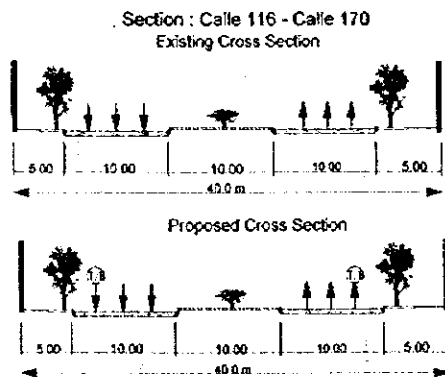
Typical Cross Section on Avenida 7a (3)
